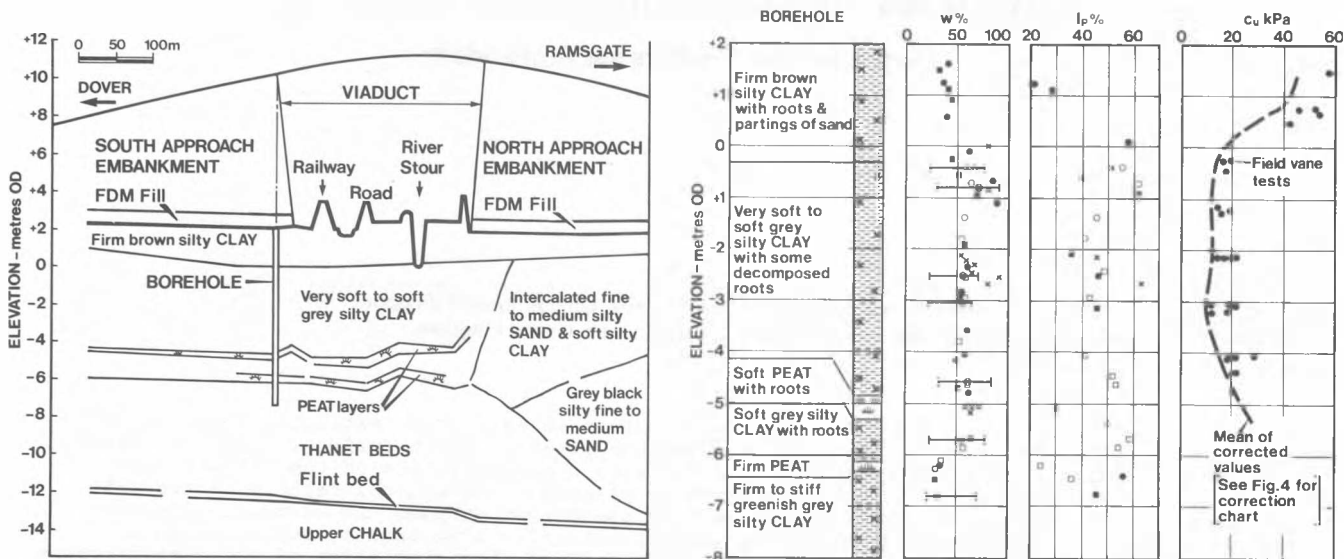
Sandwich By-Pass. Longitudinal section, borehole log and soil properties
